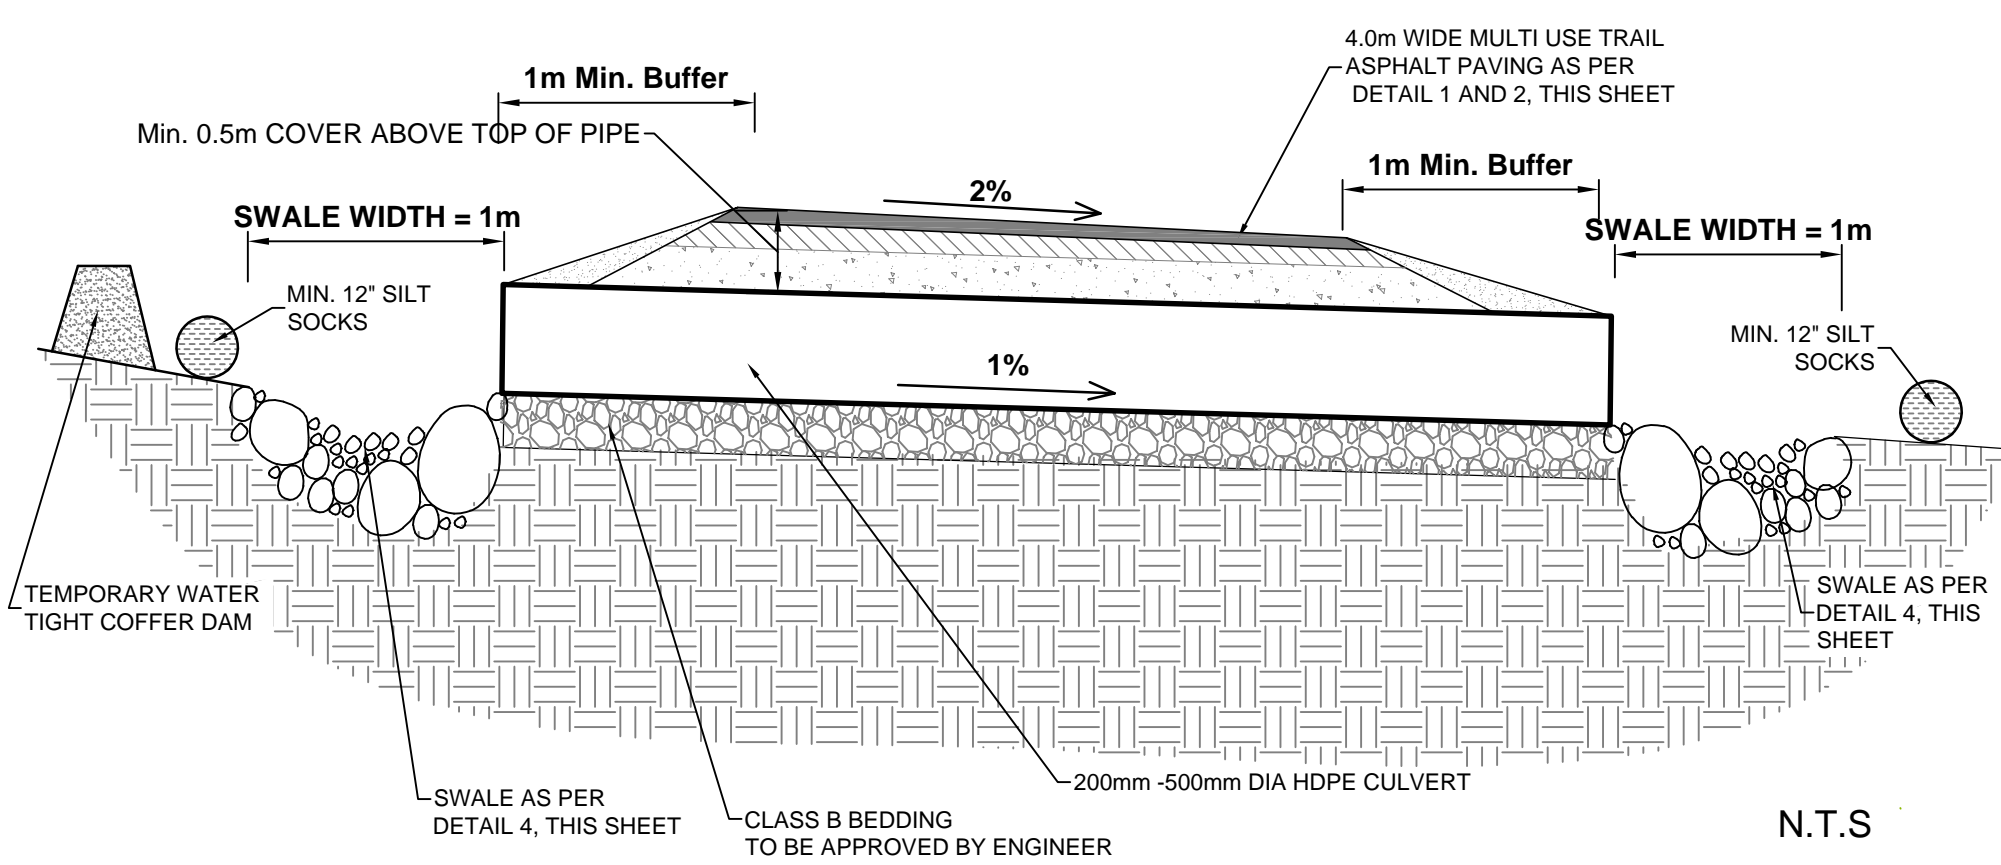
TYPICAL TRAIL SECTION (4m WIDE)
